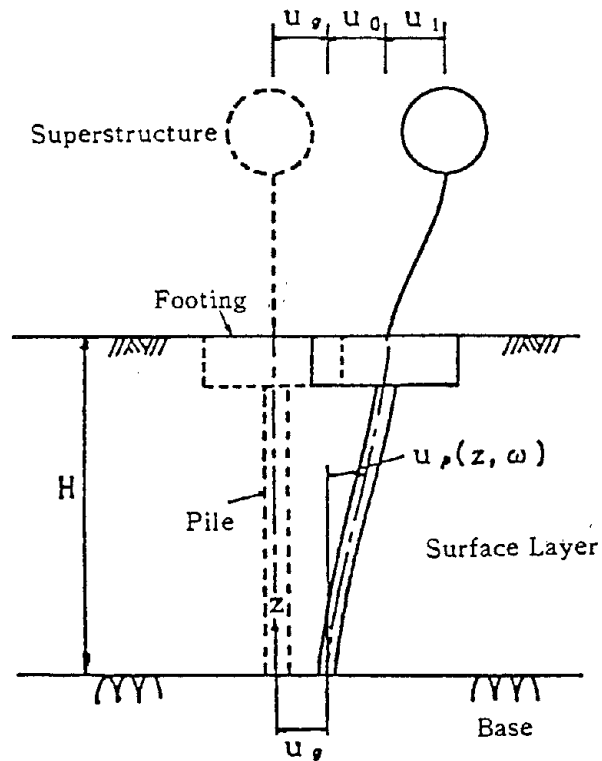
Pile foundation with a one-degree-of-freedom model for the superstructure (Single pile)
